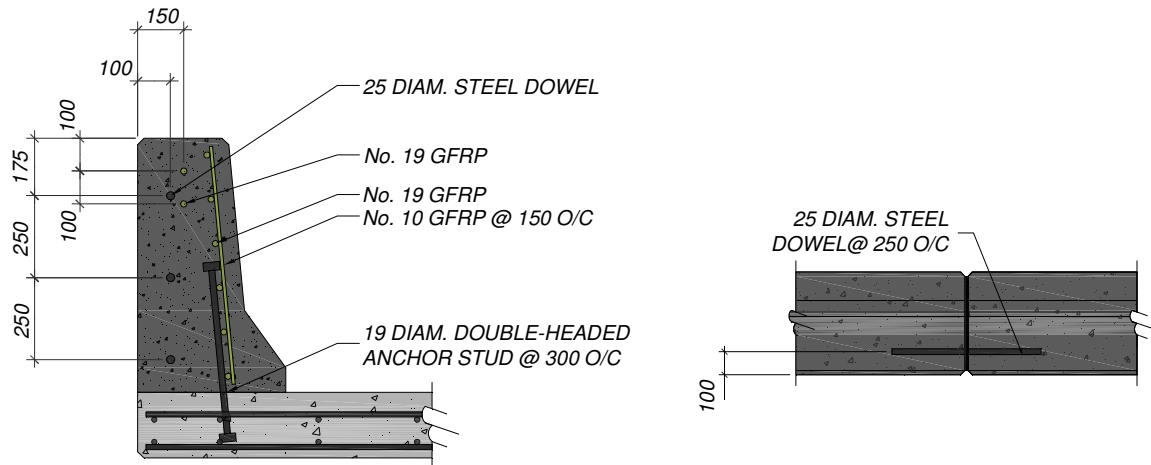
Barrier wall concrete details (Cross section “C” from Figure 3-3(a))
